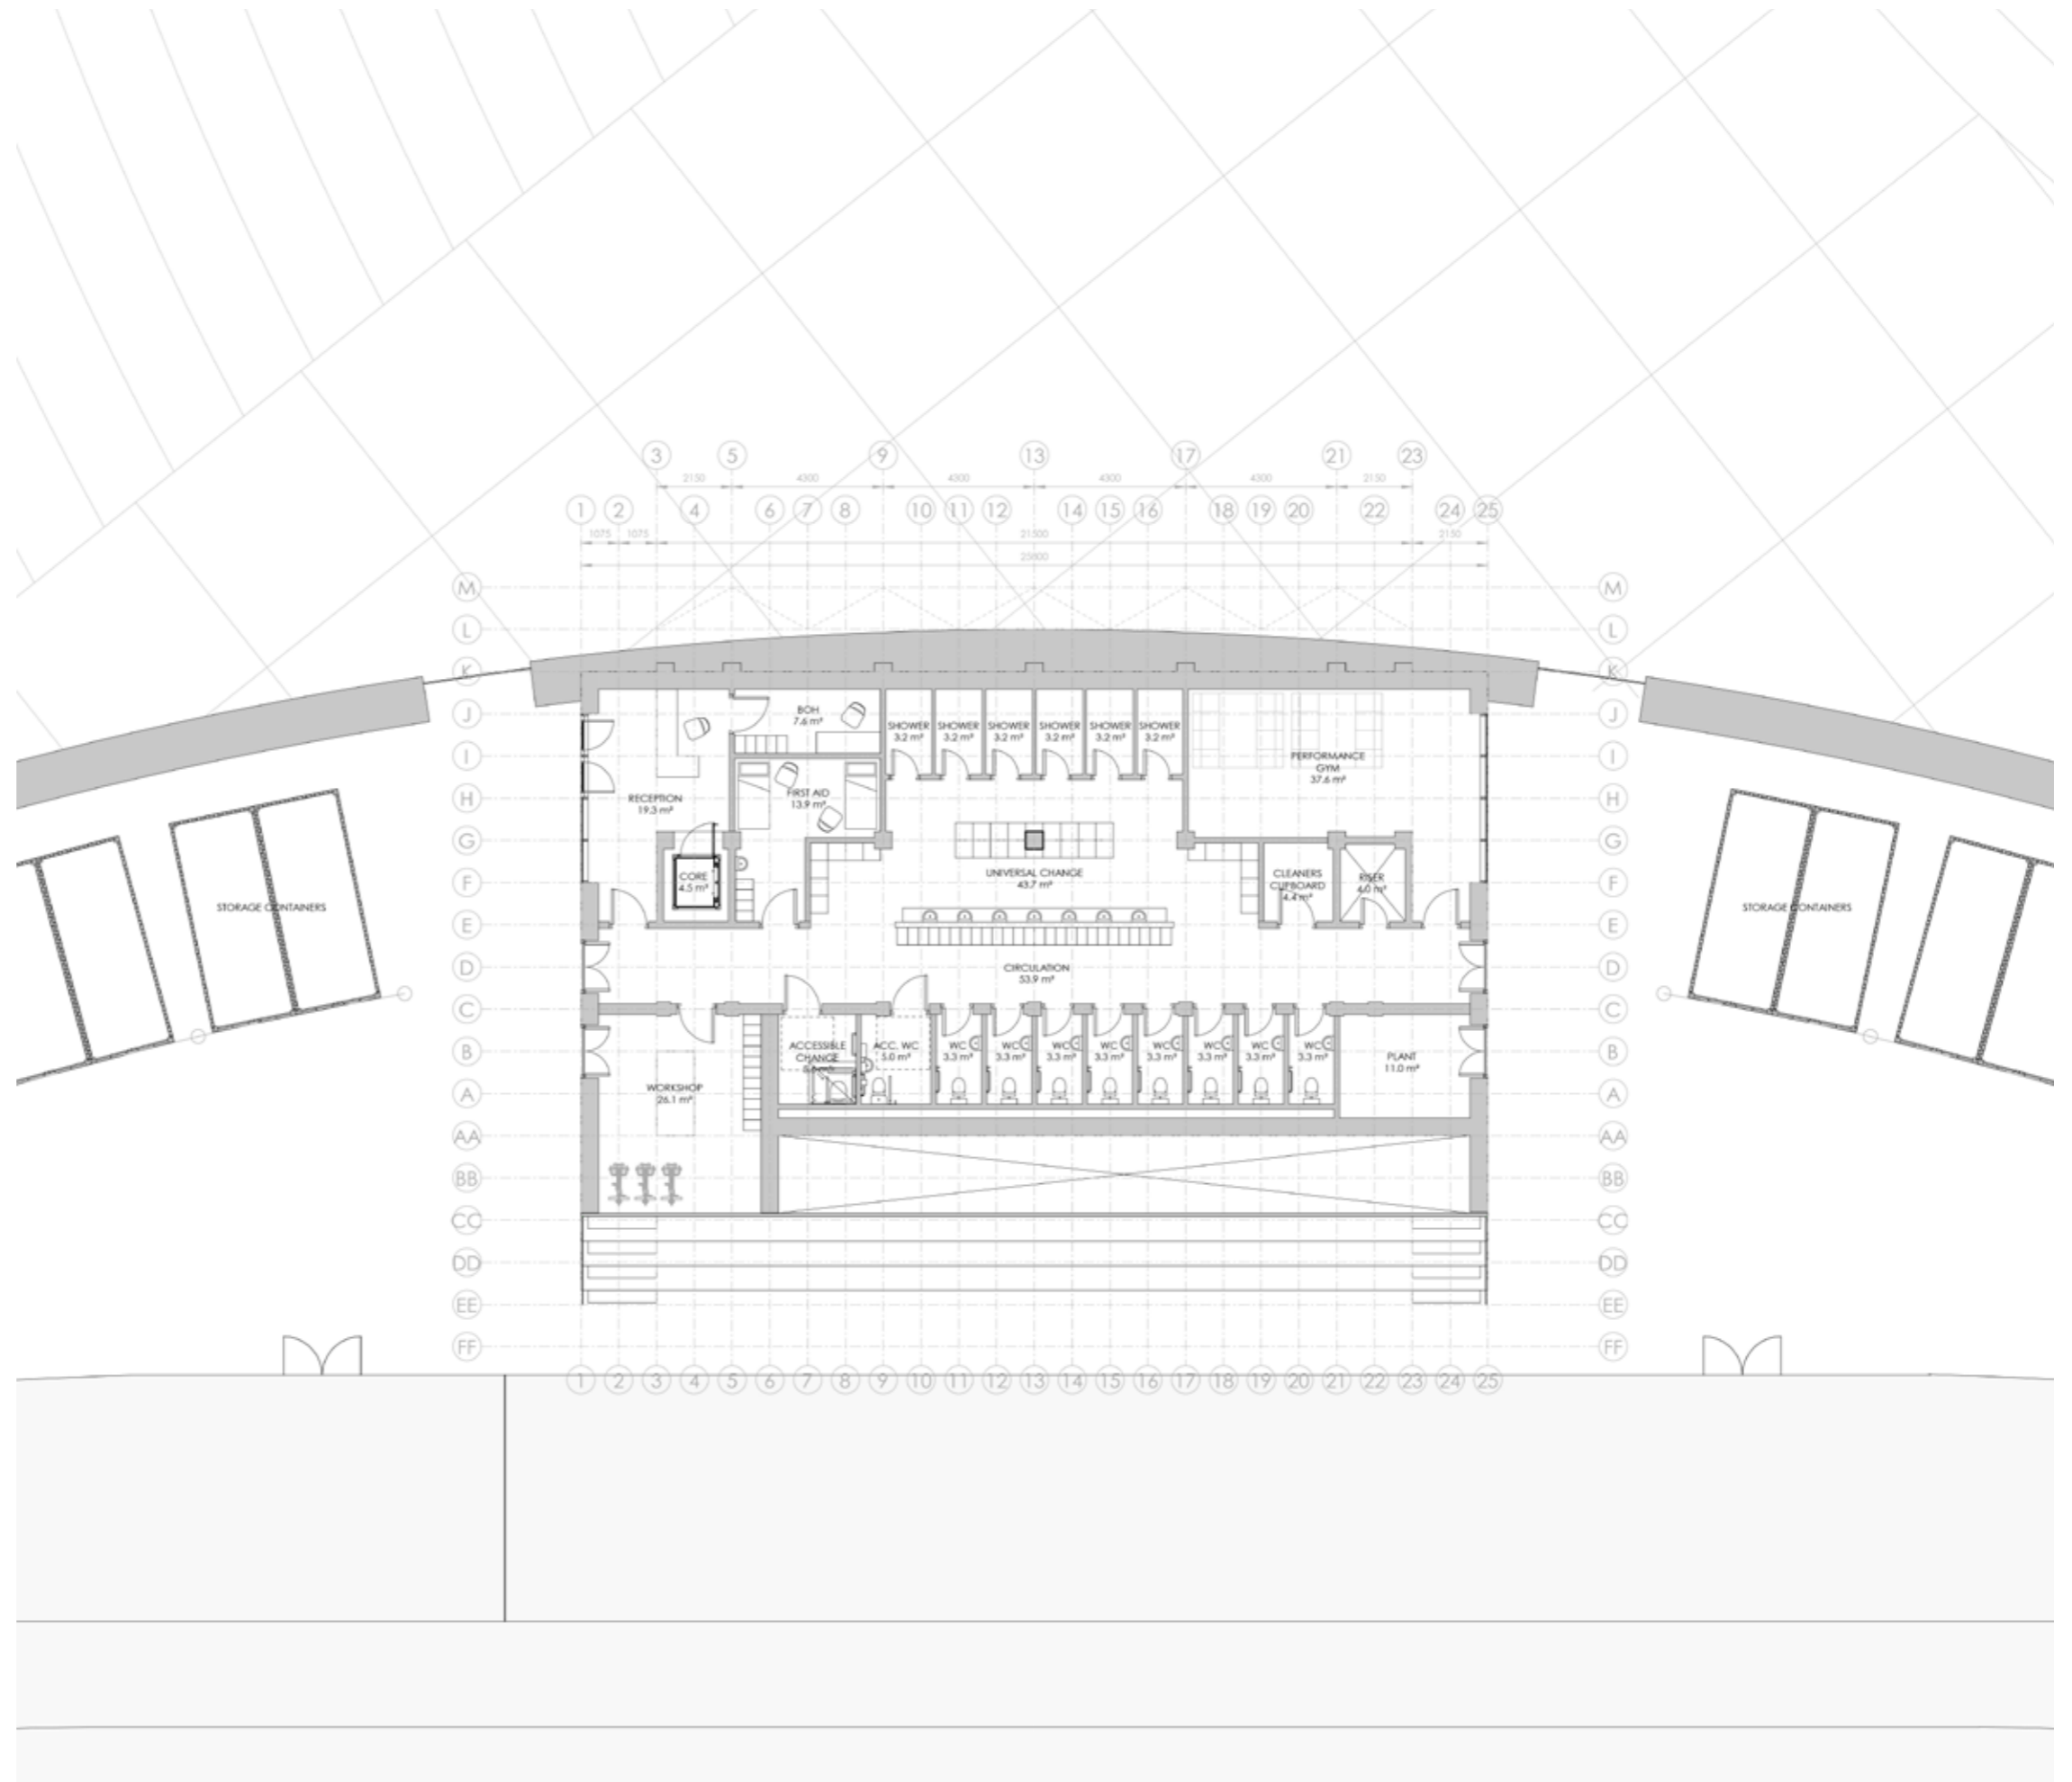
(above): Extract from drawing 3617-FBA-00-XX-DR-A-01000\_GROUND FLOOR PLAN
